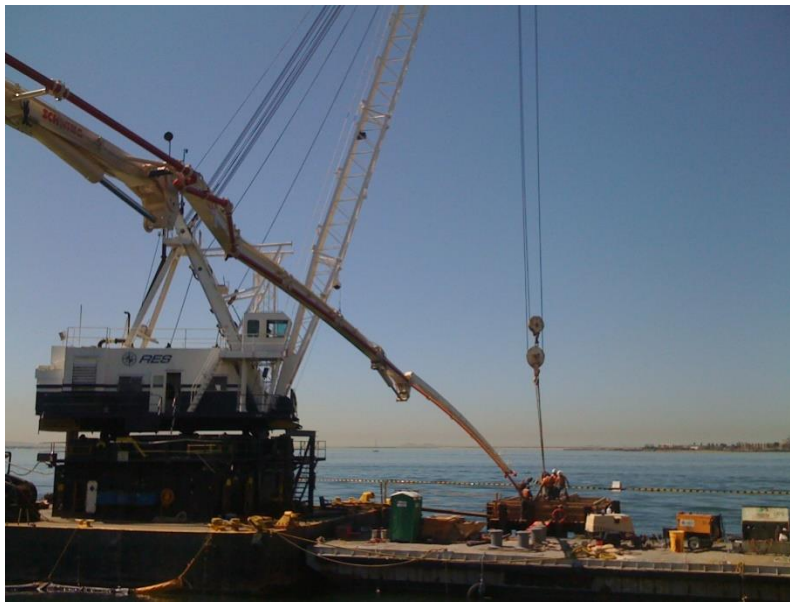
Pier External Support Resources (from R.E. Staite Engineering 2012)
